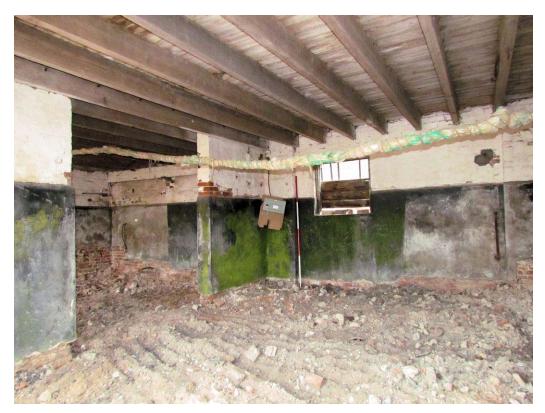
Interior of Bay 3, Looking East (Scale = 2m).
